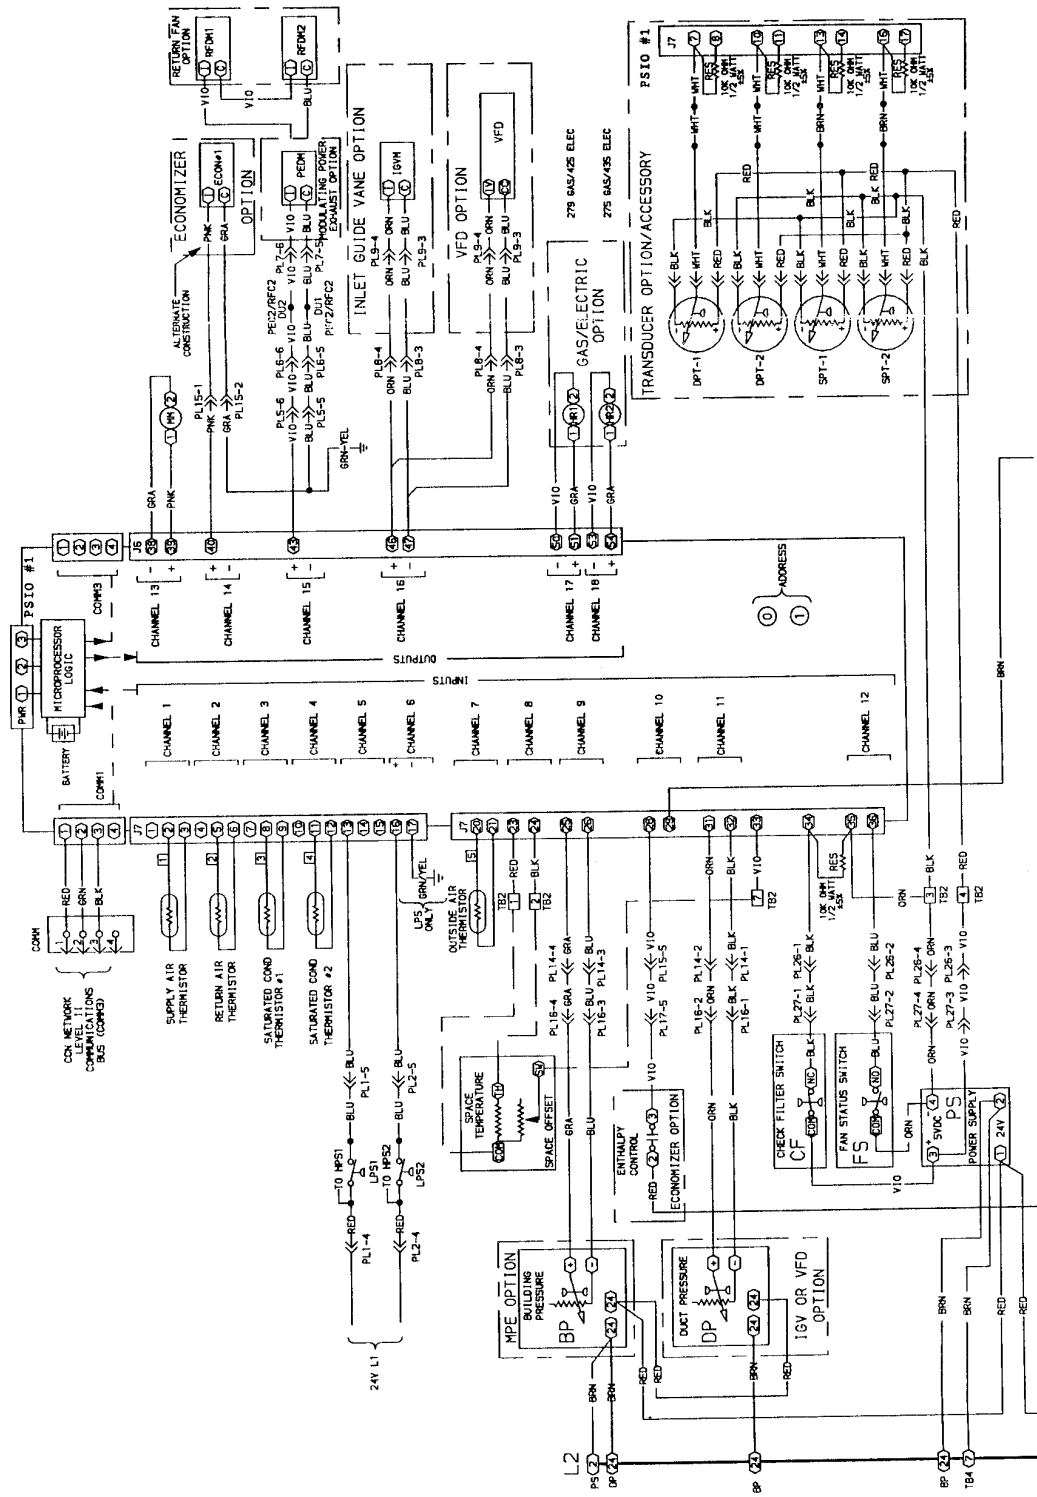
Typical Control Wiring (Sizes 055-075 Shown)
